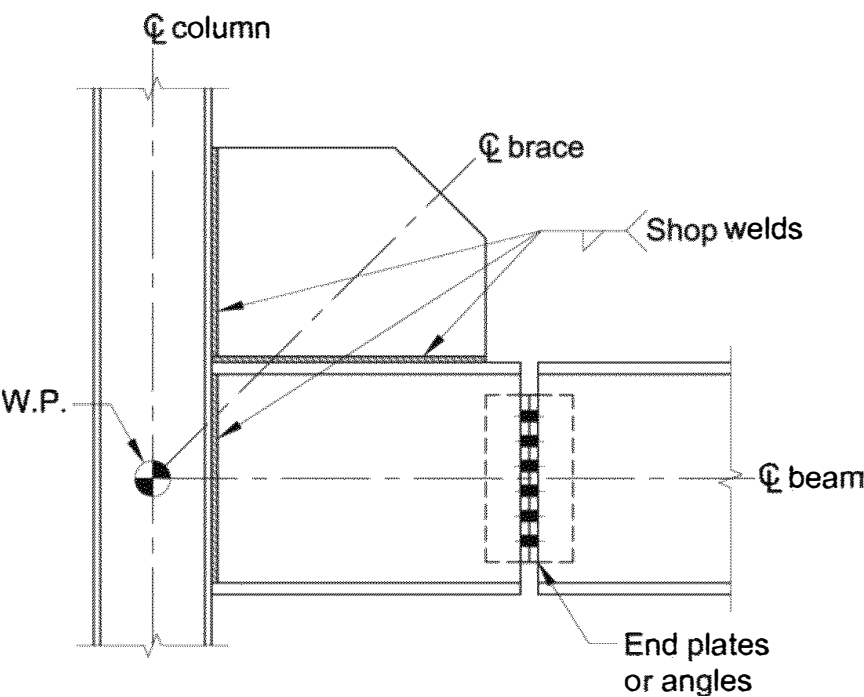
Beam-to-column connection that allows rotation (Thornton and Muir, 2008).
